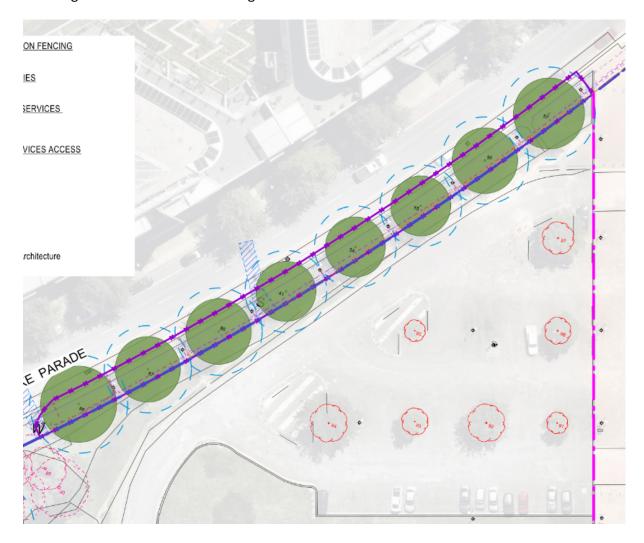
Snapshot of tree 78 on the Tree Management Plan site plan outlining the Tree Protection Fencing in PURPLE.
